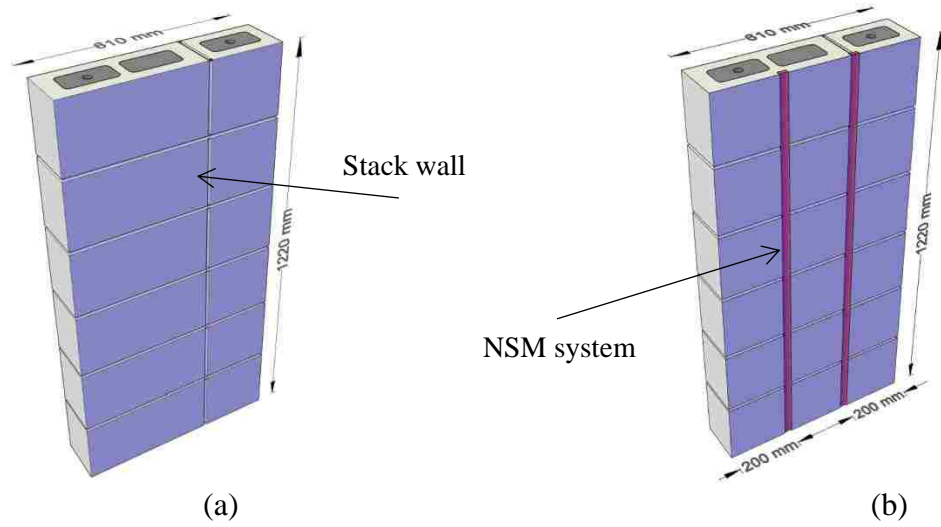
Test specimens: (a) stack pattern, (b) strengthened wall
